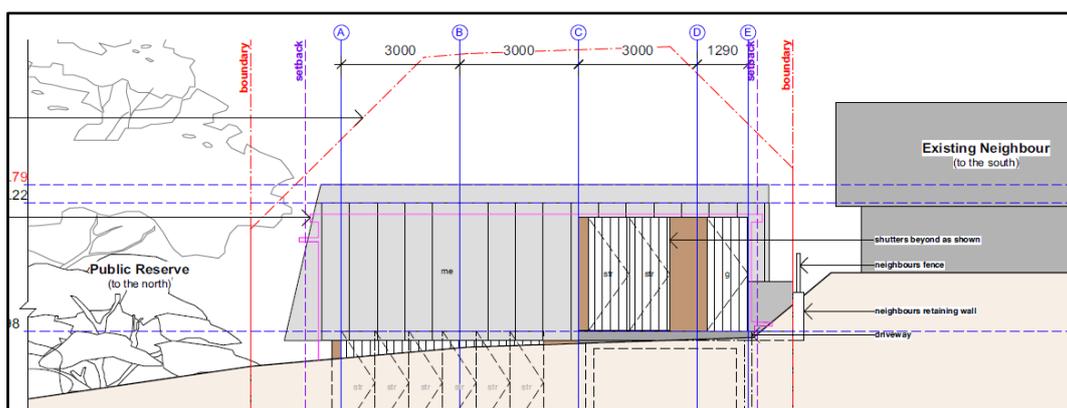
Western elevation of new building showing outline of existing building (in pink)
